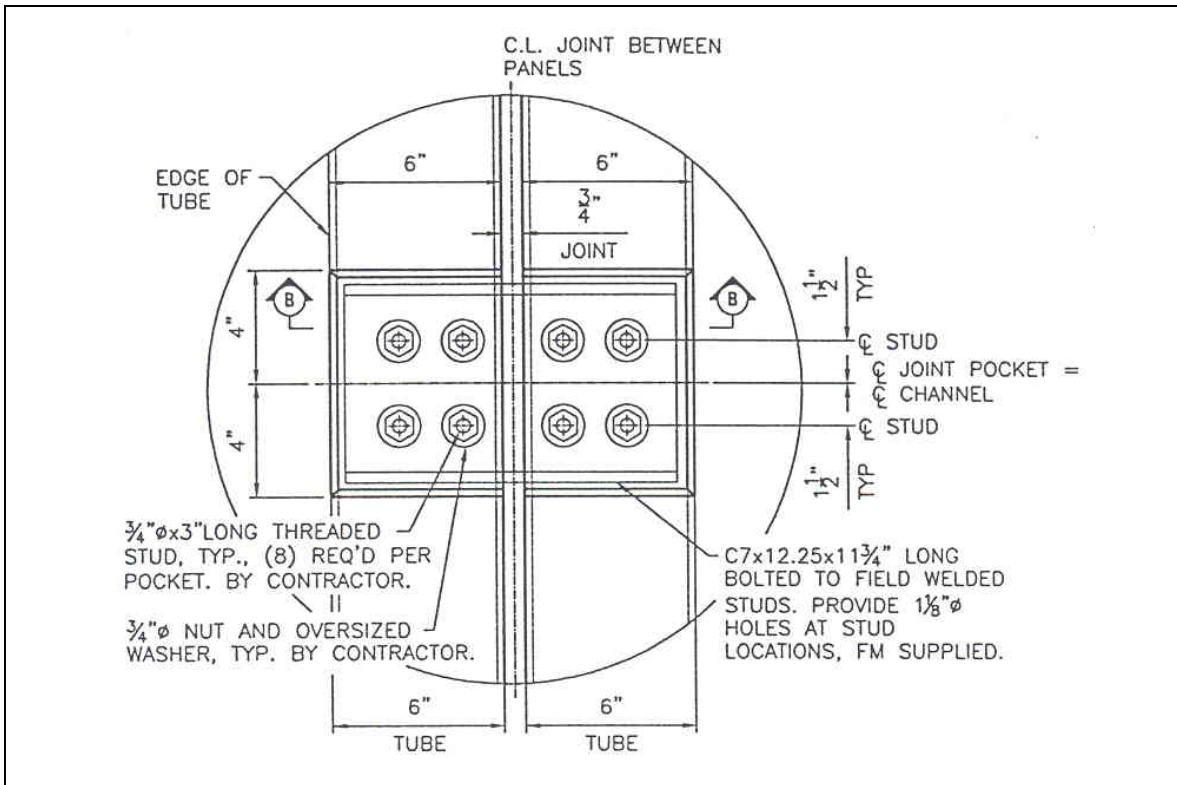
Panel to panel connection plan view for bridge over Little River Town, Stowe, VT (The Fort Miller Co., Inc., 2000)
